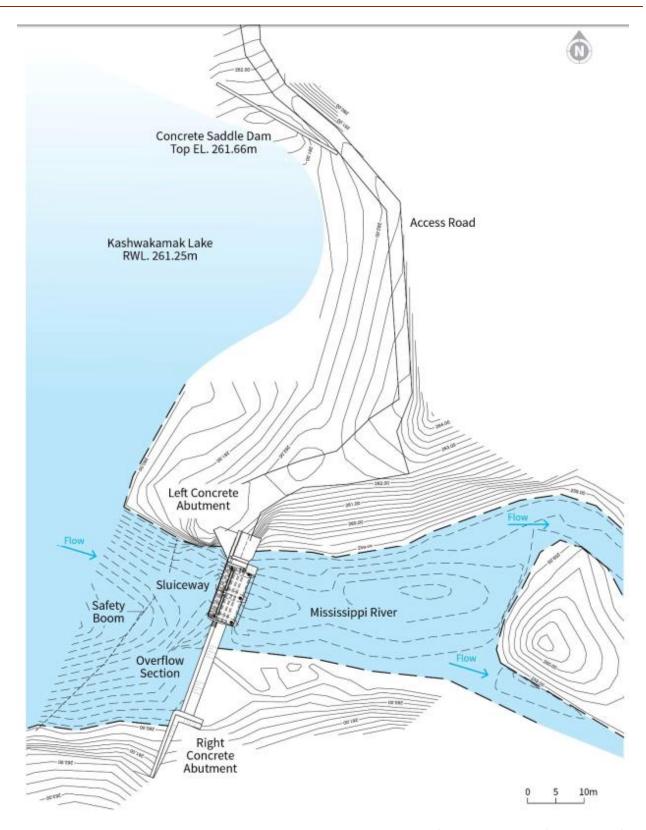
Detailed Site Layout – Kashwakamak Lake Dam, Township of North Frontenac (Hatch, 2022)
